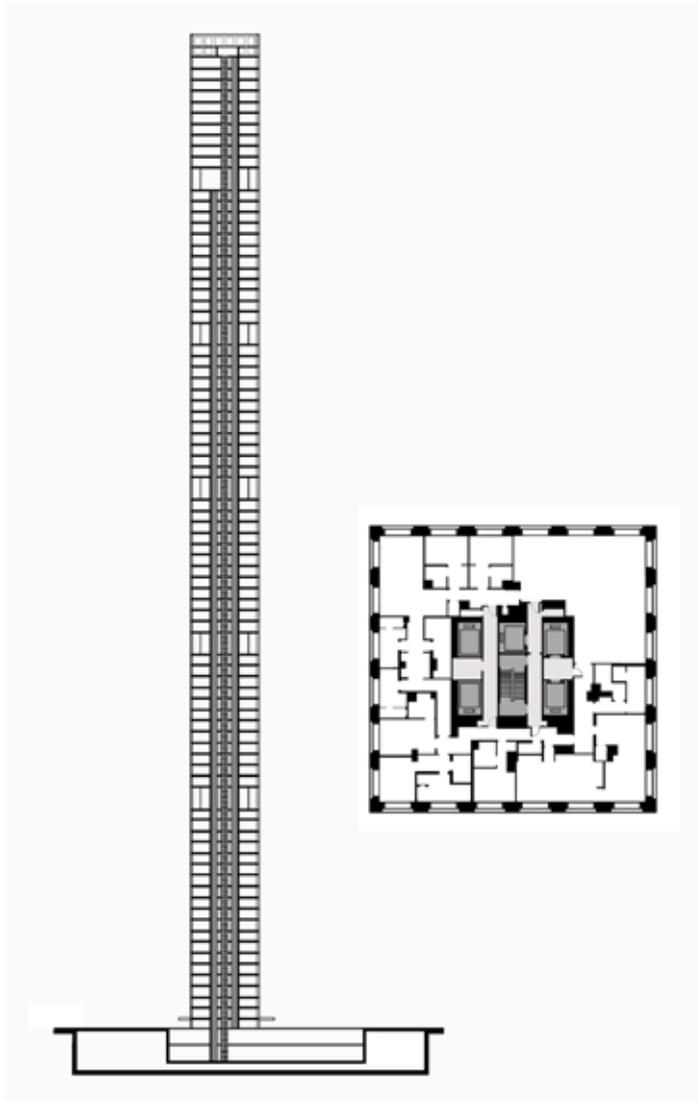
432 Park Avenue: plan and section (developed by authors based on [47])
